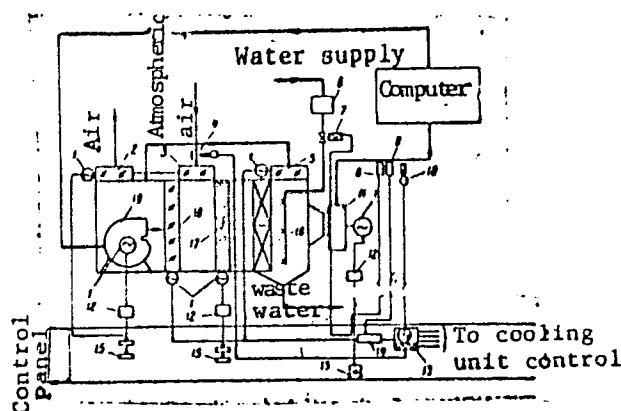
Air-conditioning system with surface air coolers (schematic drawing)
